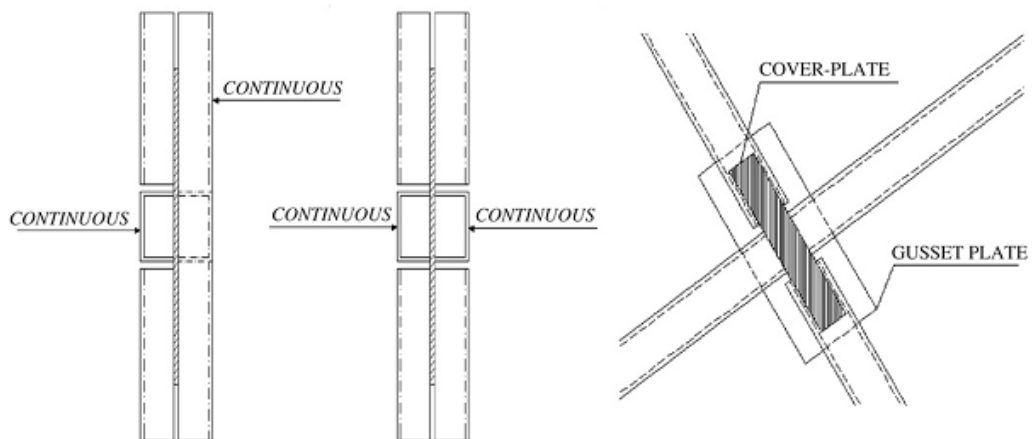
Mid-connection details (Davaran and Hoveidae, 2009)
